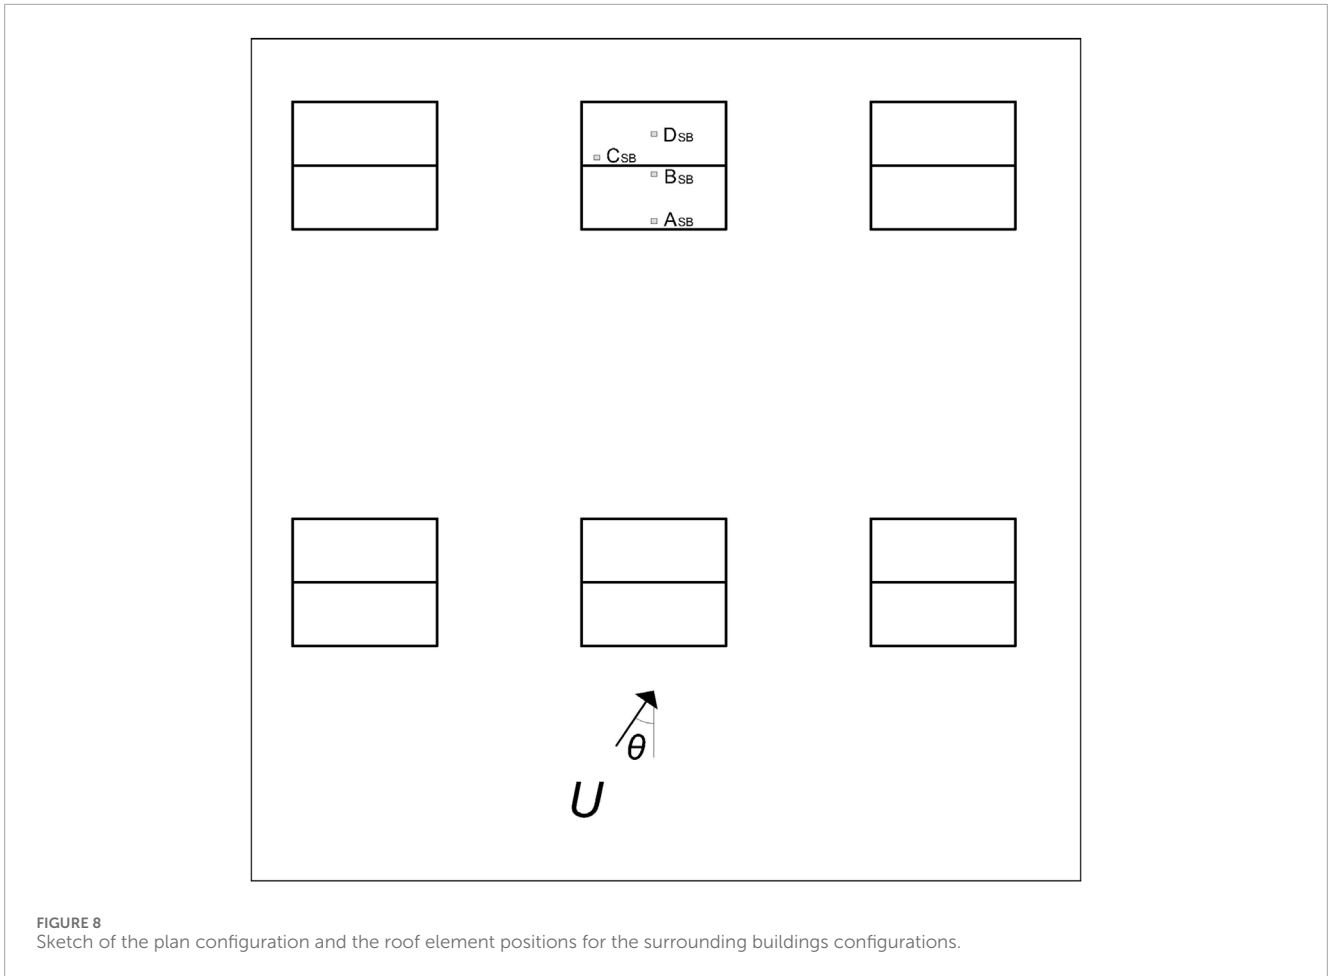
Sketch of the plan configuration and the roof element positions for the surrounding buildings configurations.
